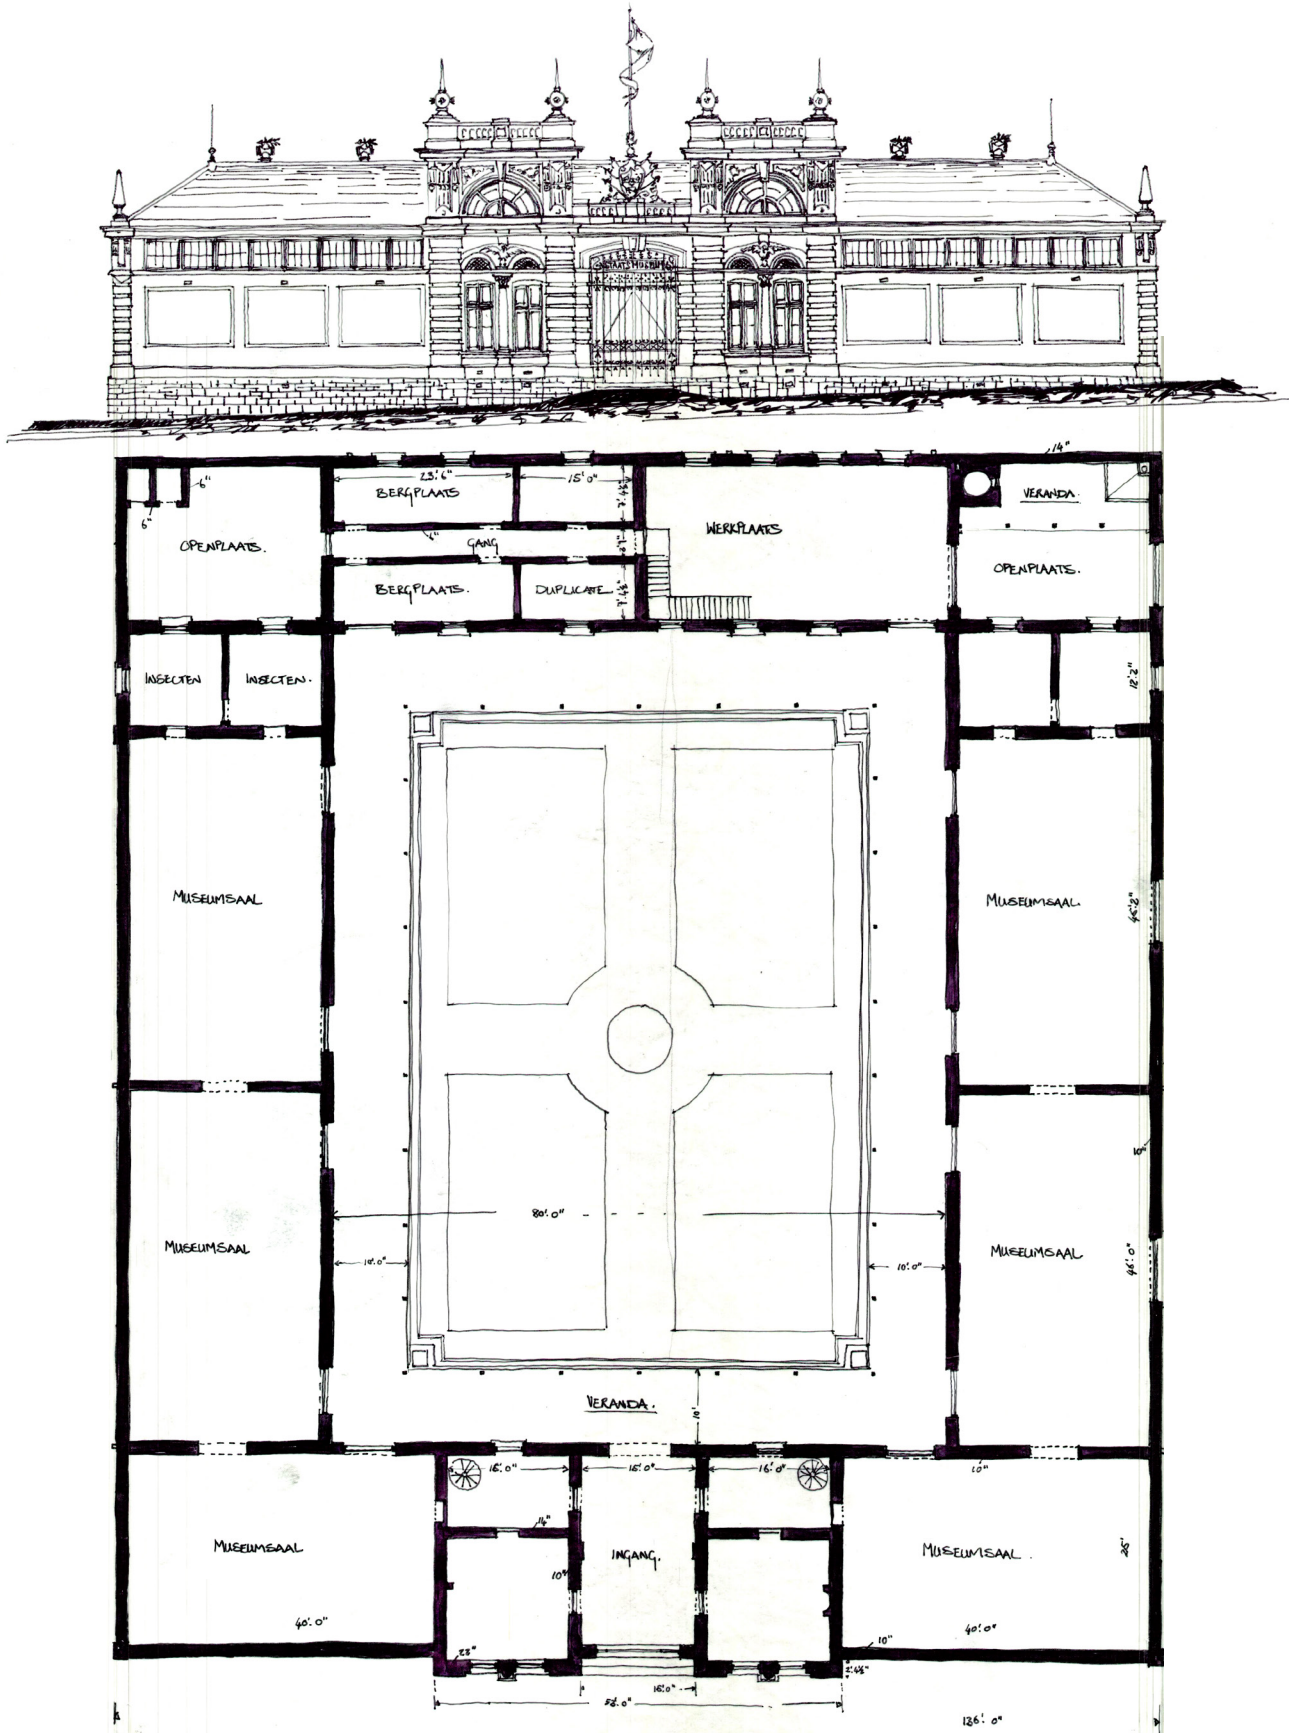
Hand drawn copy of the original south elevation and ground floor plan of the Staatsmuseum
